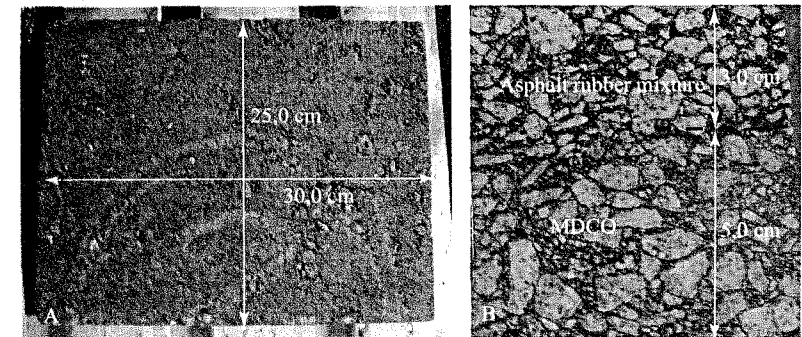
Wheel tracking slab (A: dimensions in plan view; in B, cross section view showing the configuration adopted for asphalt rubber mixtures in the test)
